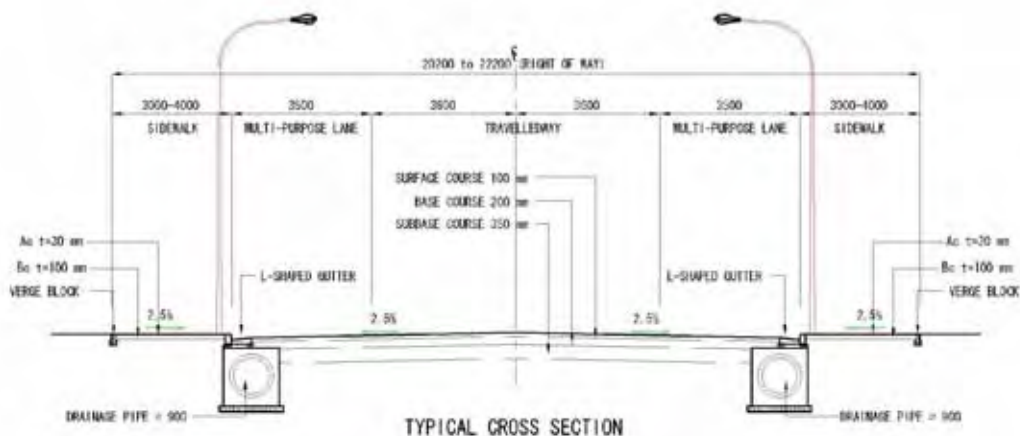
(b) Typical Cross Section of Circumferential Street C2 (Inside CCD)
